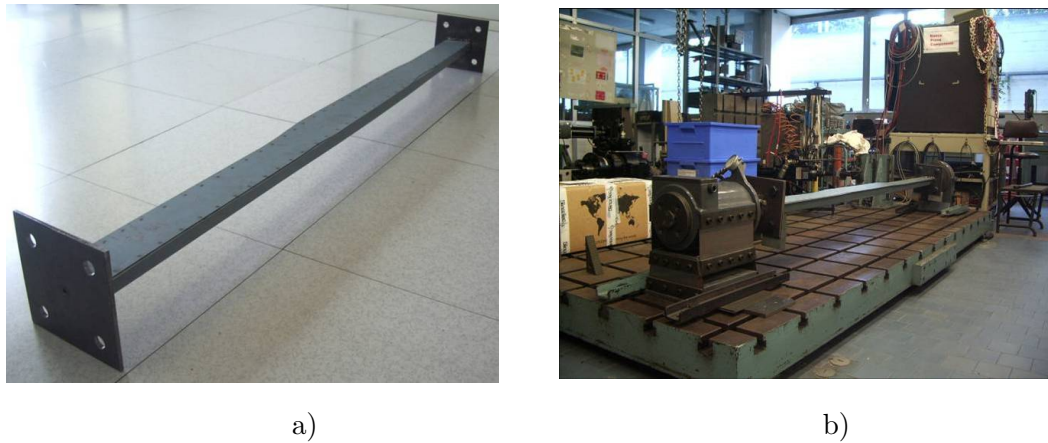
Closed (a) profile and (b) Schenck torsion test machine used to perform the torsion tests.
